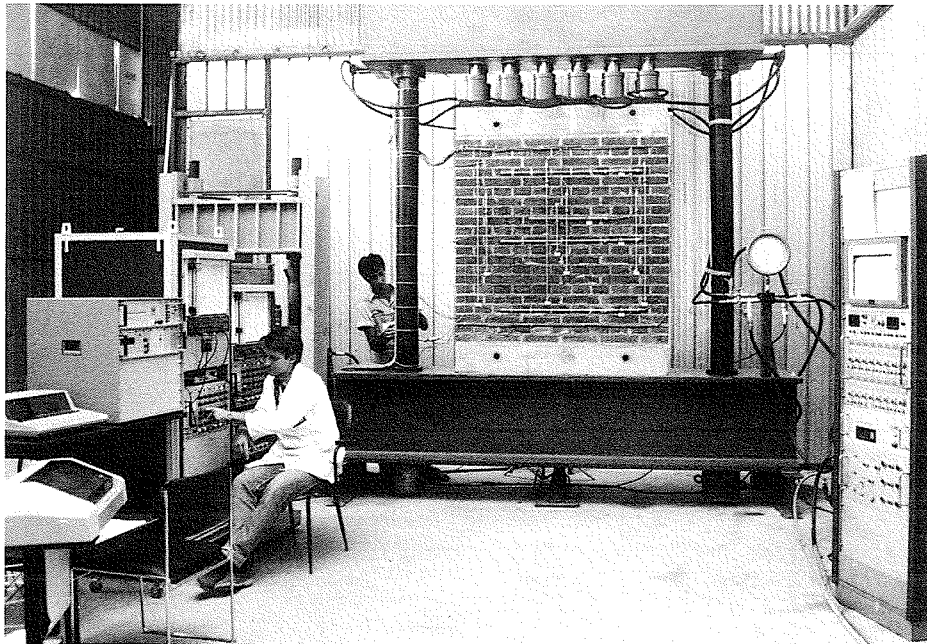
Loading and measuring equipment used for the calibration of flat-jack test
